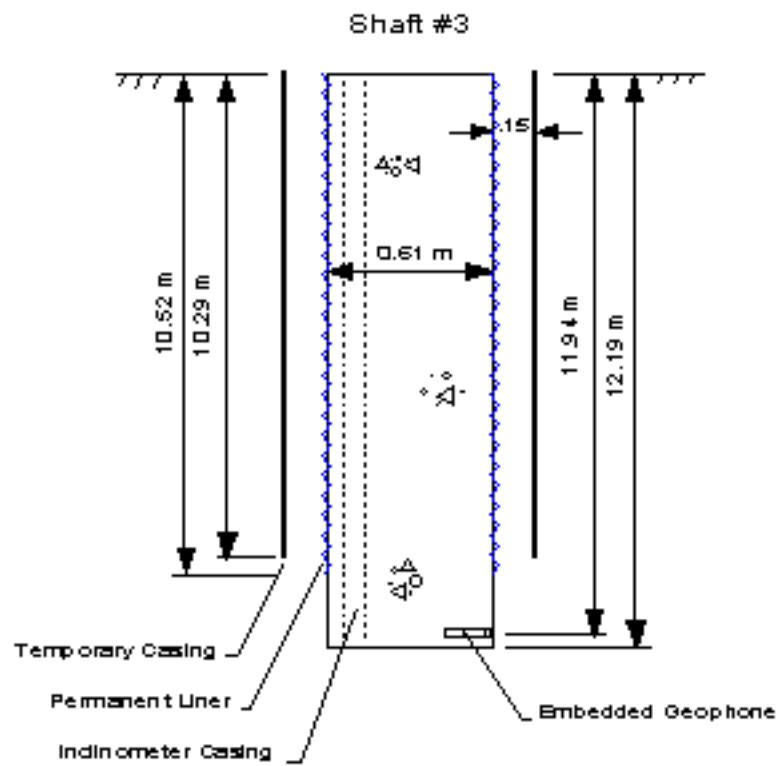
Detailed Schematic of Shaft 3 - Accessible-Head Condition
